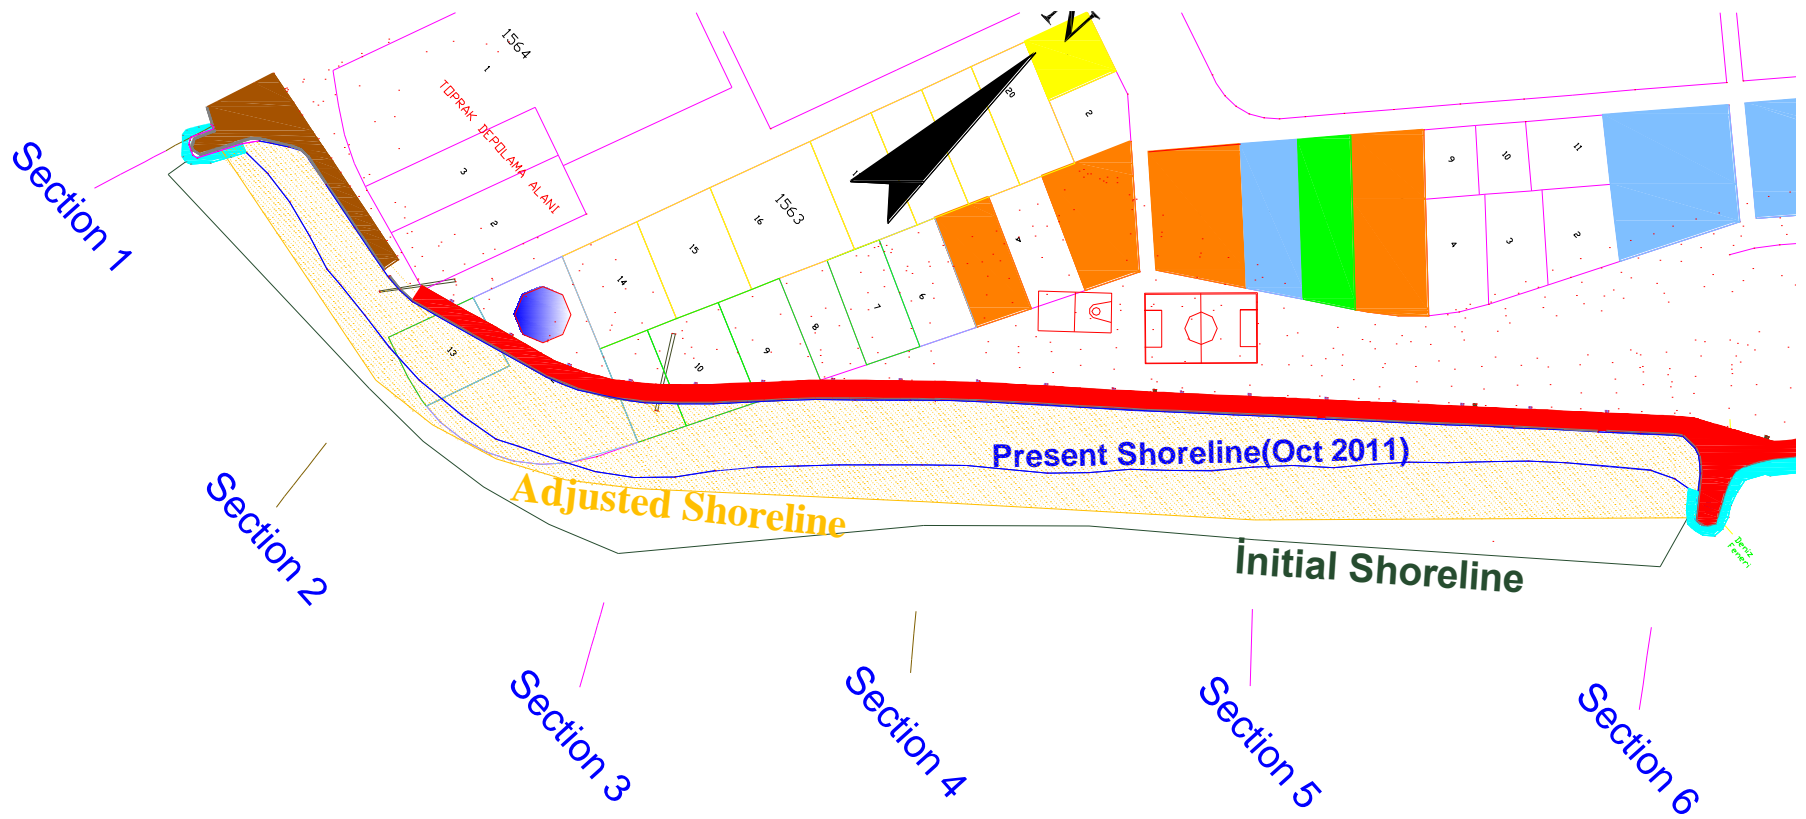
Design plan view for 20 m new dry beach width ($D_{fill}=0.45$ mm).
